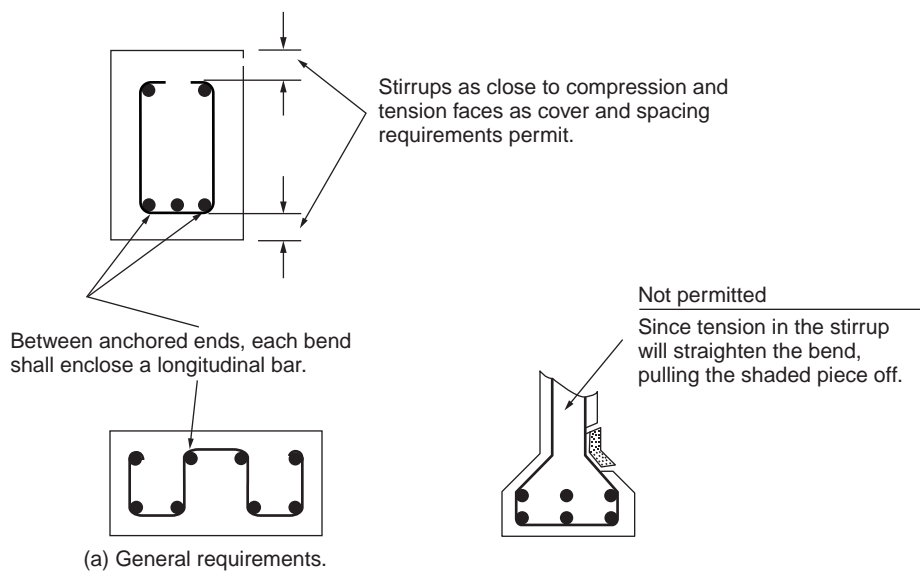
Stirrup detailing requirements. (Source: Wang and Salmon, 1985.)
